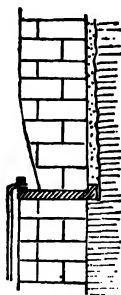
Cast-iron Water-ring or Garland built in Shaft Walling, and Pipe to conduct Water down Shaft
